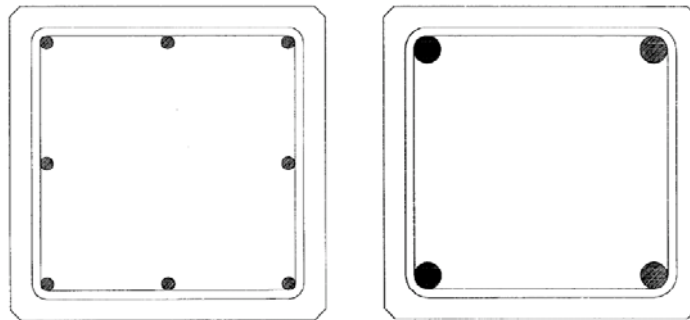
Concrete cross section (29cm x 29cm): 8-φ12mm and 4-φ 25mm rebars with 3cm concrete cover.
